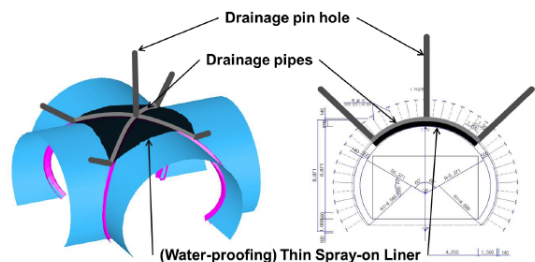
Drainage system using drainage holes at the inside of underground structure (KICT, 2013)
